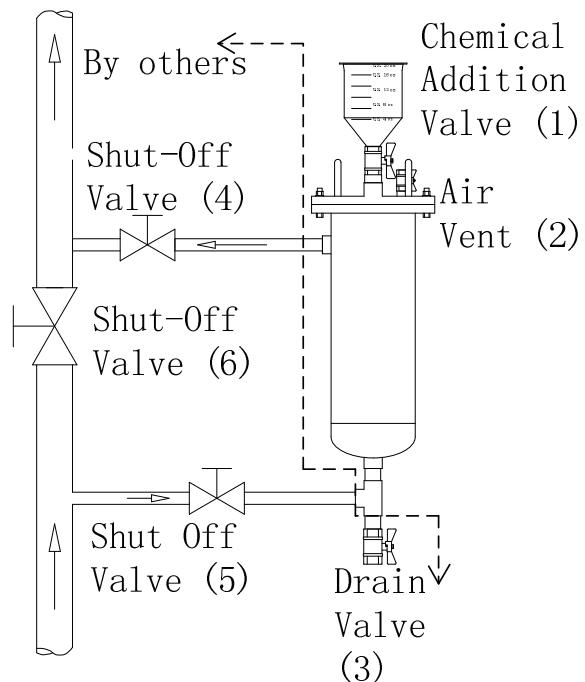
Installation method 2 – CBF-HP installed in parallel with the system piping
